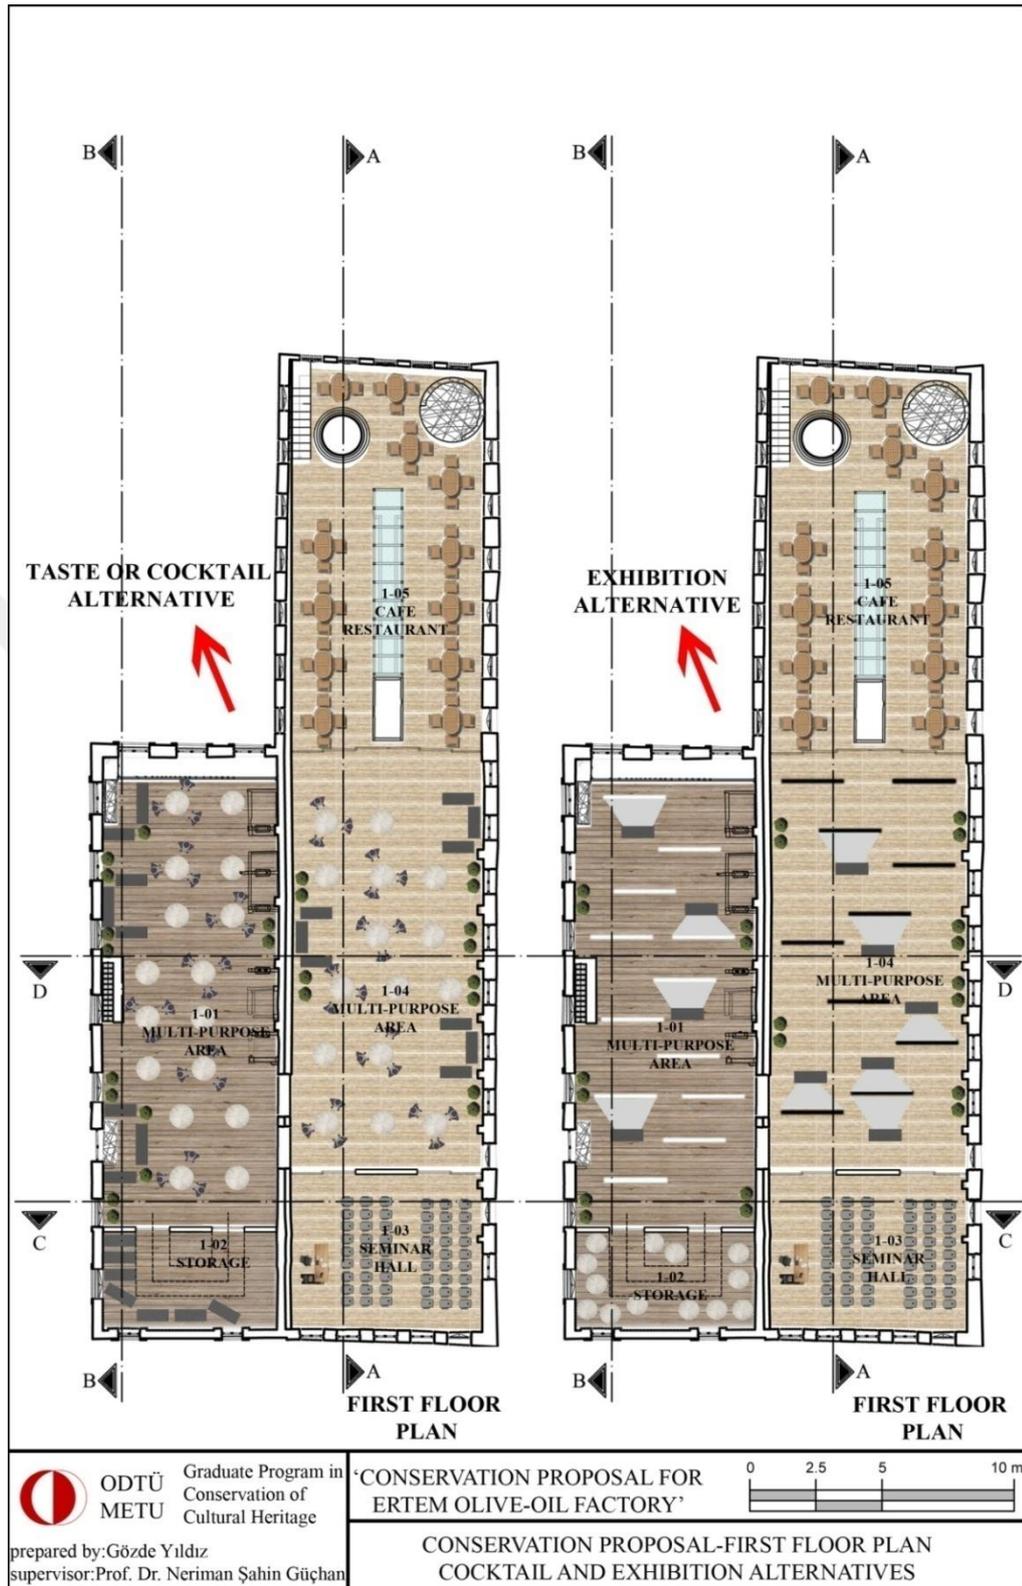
Conservation proposal, first floor plan, two alternatives of multi-purpose areas
